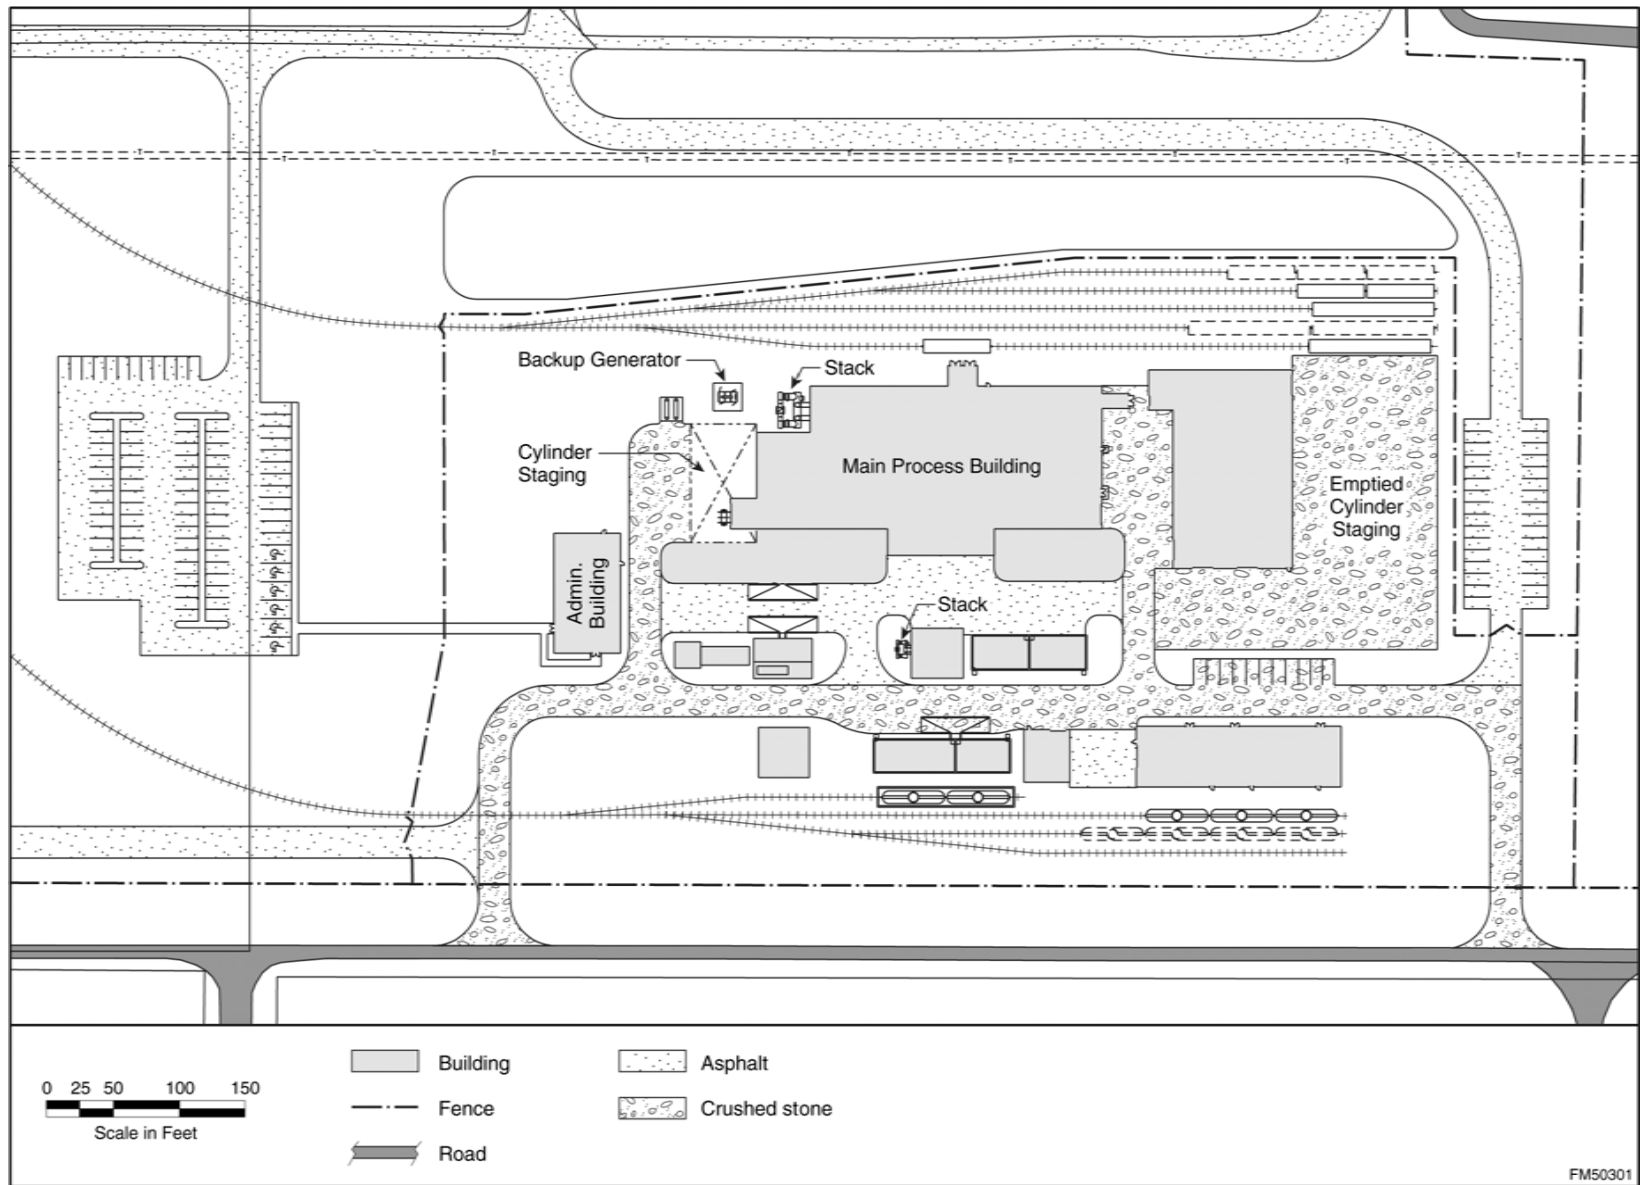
Conceptual Conversion Facility Site Layout for Paducah
